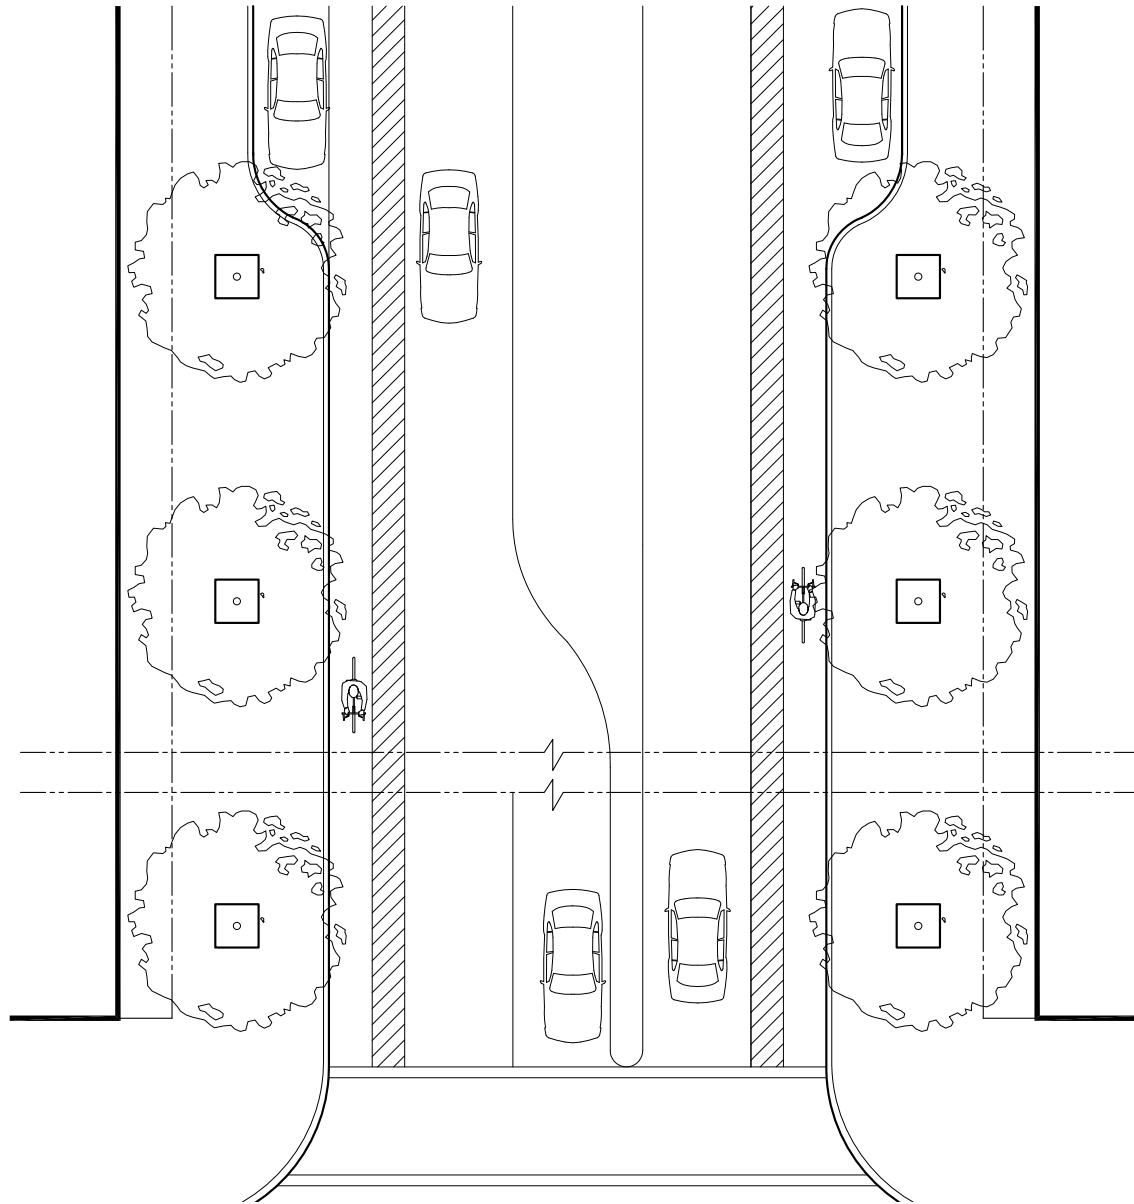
Street Type 2: Connector Street – Typical Intersection (Plan View)
